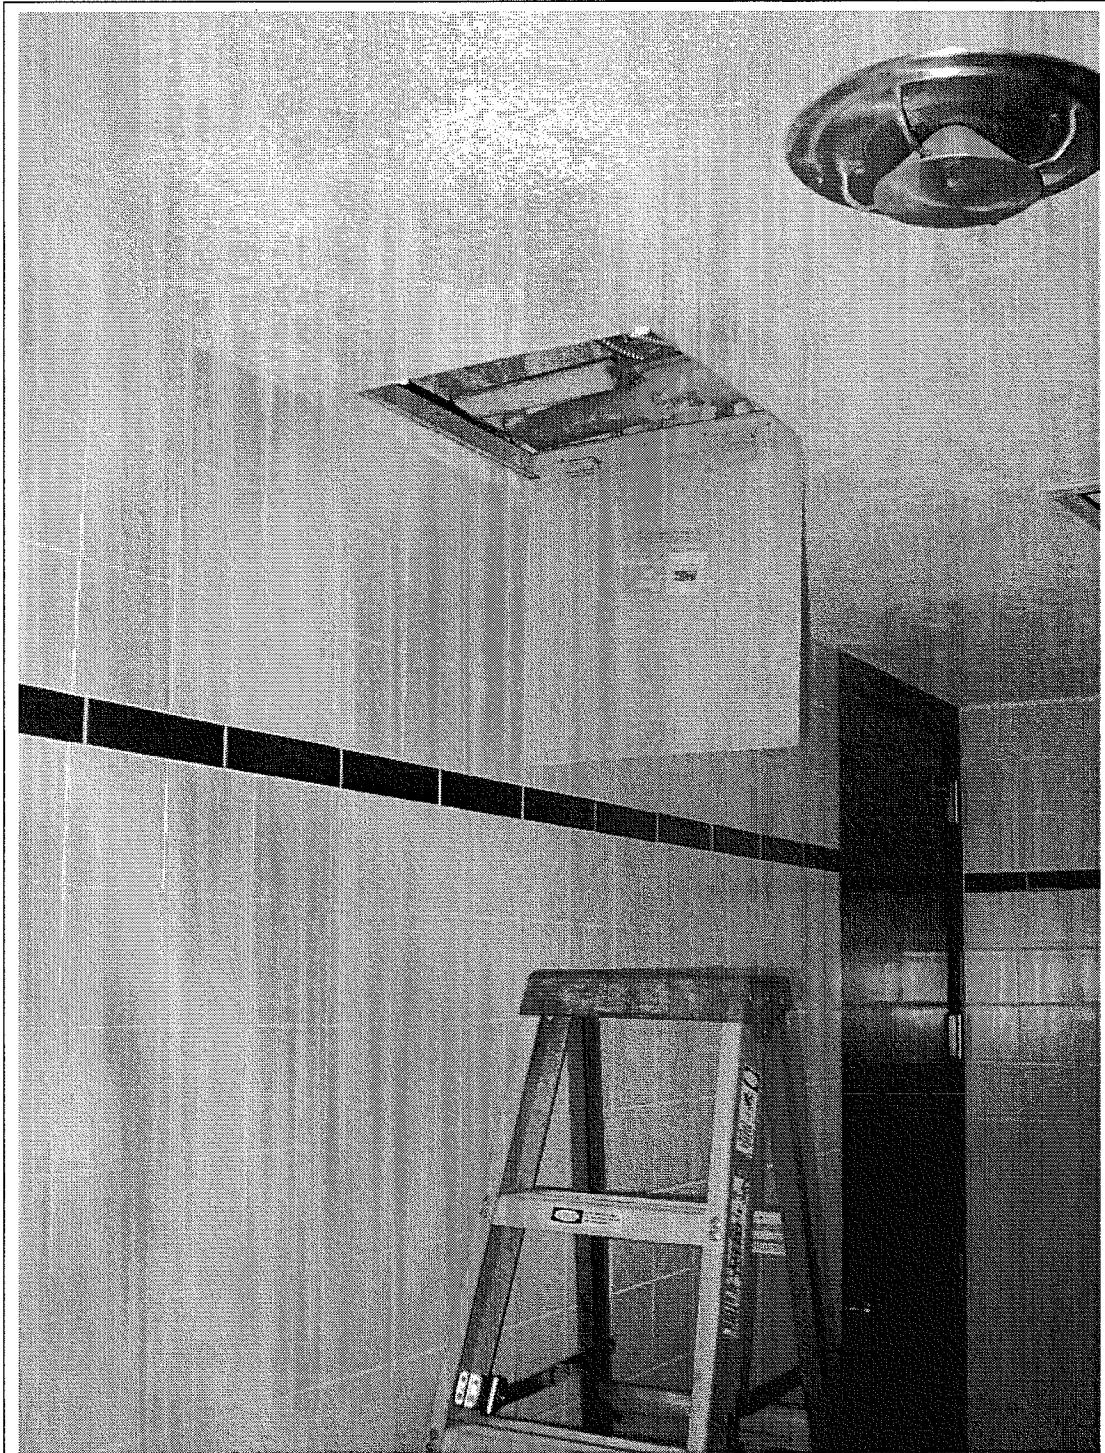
View of access hatch to plenum space containing fireproofing in Men's restroom – North lobby area
